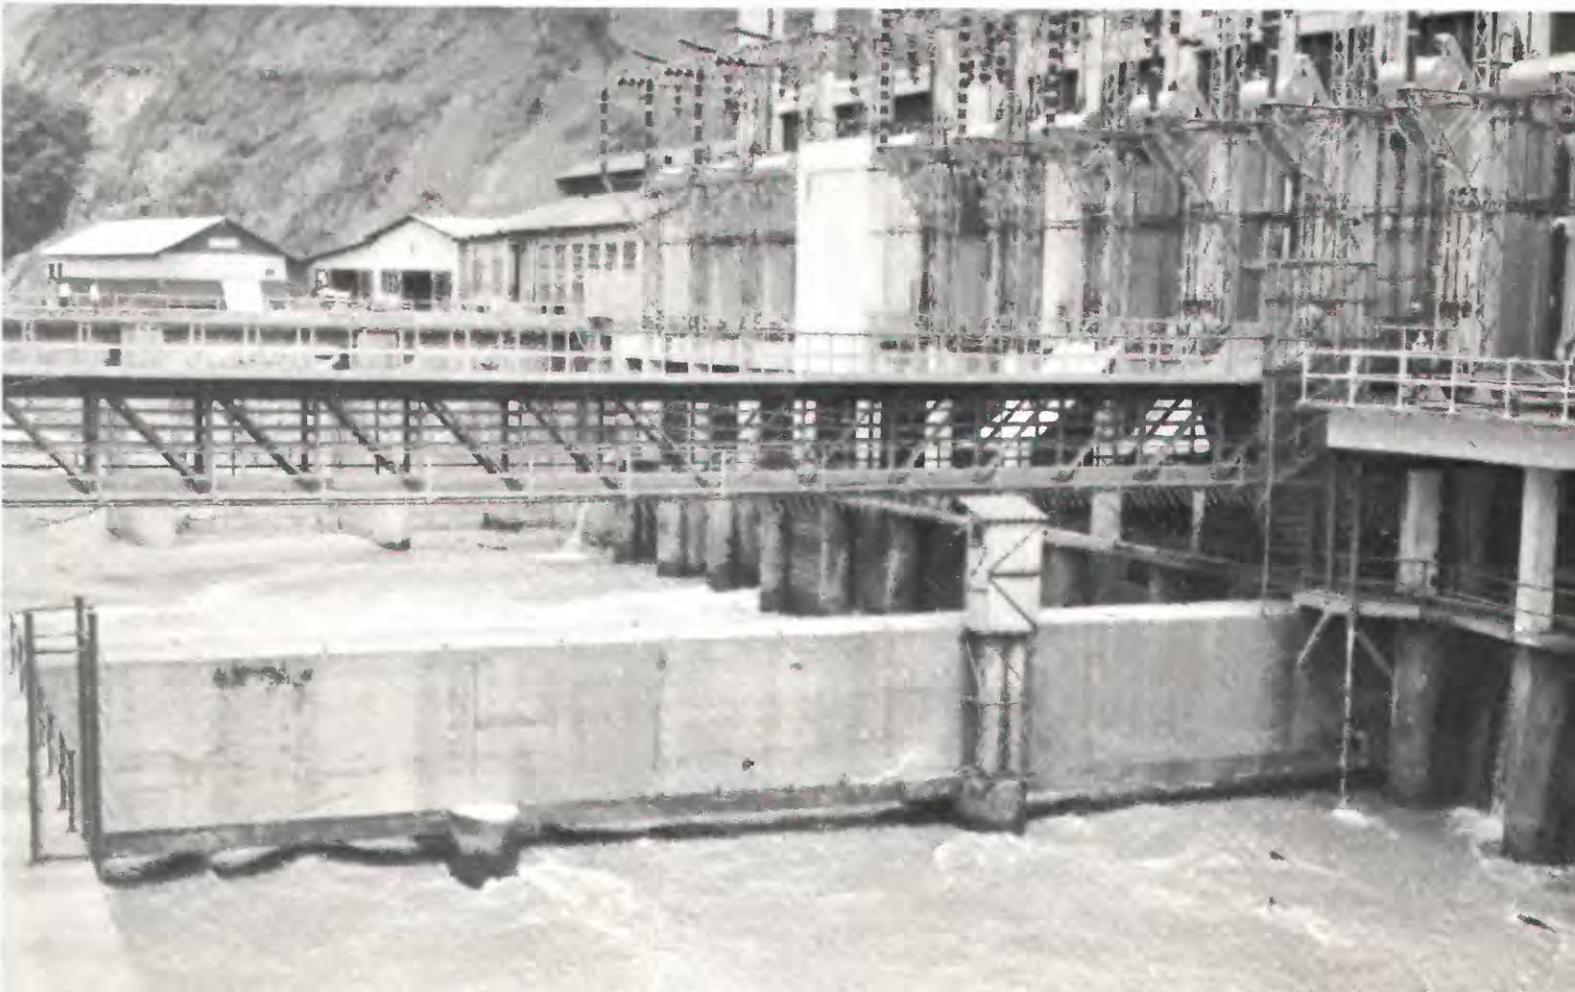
Tailrace channel of new Fontes powerplant choked by Lajes Creek valley mudflow, looking upstream. Water at left is spilling over city of Rio de Janeiro's water-supply conduit. Foreground space below conduit is tailrace channel of old Fontes plant.
